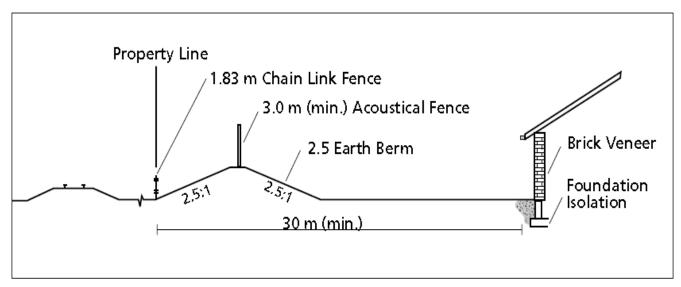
Typical Building Setback and Berm for Residential Construction Source: Earthtech Canada, "Final Report; Proximity Guidelines and Best Practices", RAC/FCM Proximity Guidelines
